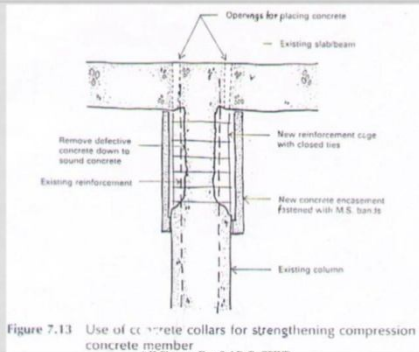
Use of concrete collars for strengthening compression concrete member
